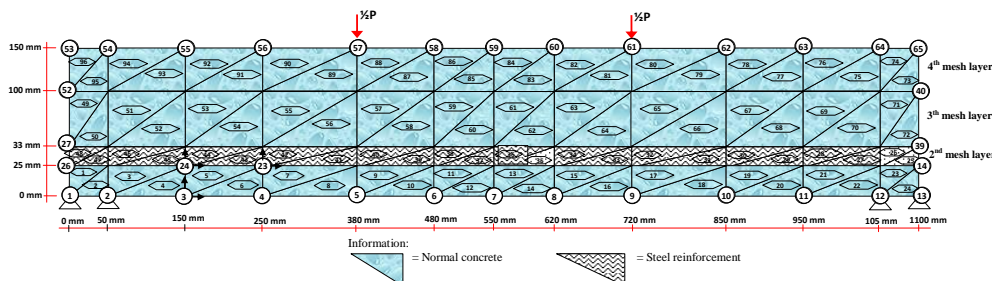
Discretization of the triangular element on the steel-reinforced concrete (SRC) beam.
